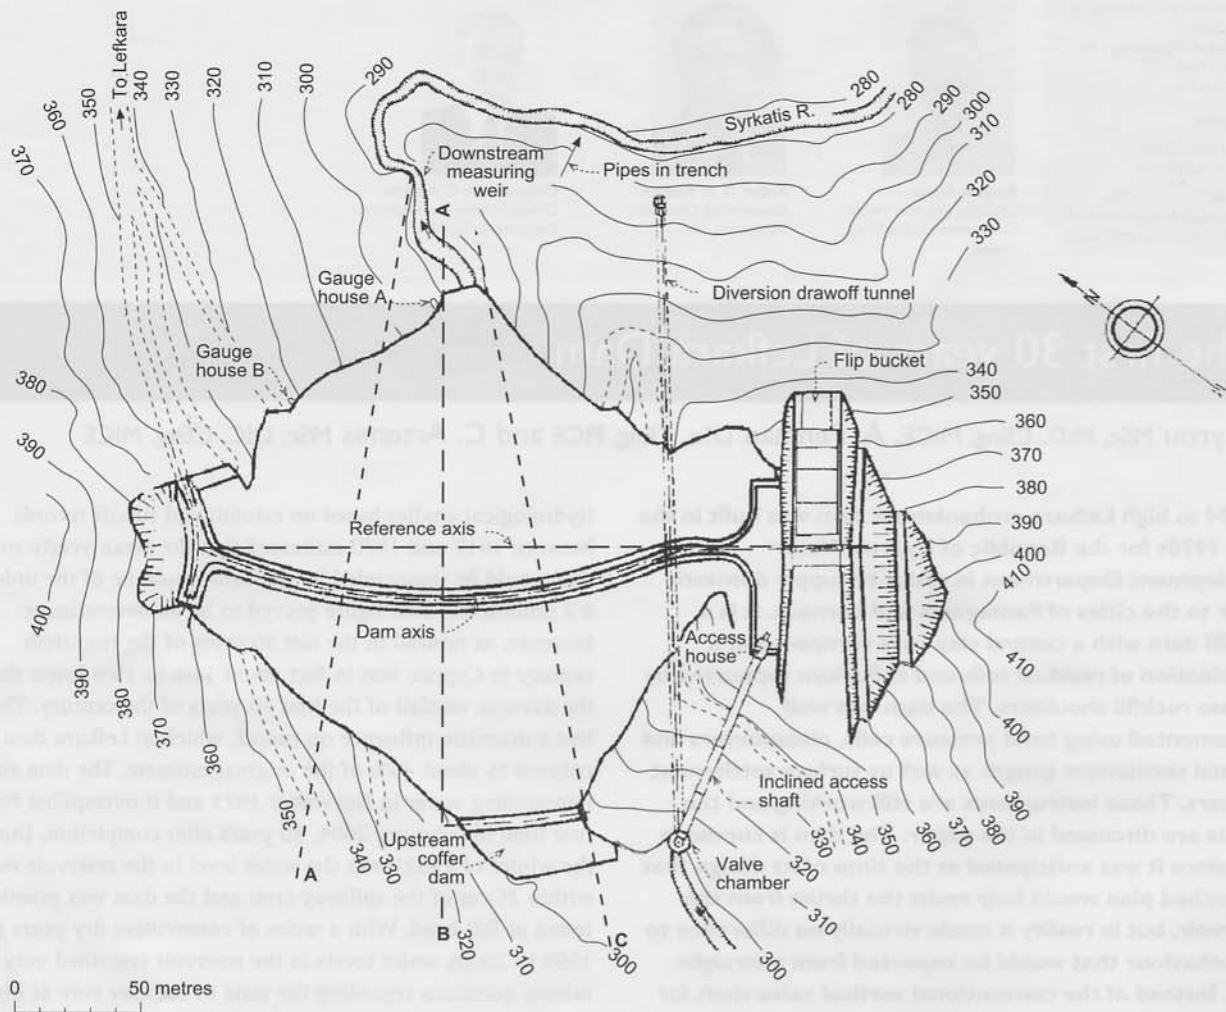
Lefkara Dam—general arrangement plan (contours in m)
